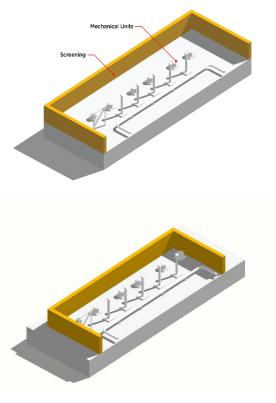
Rooftop Equipment - Parapet Wall or Central Corral
